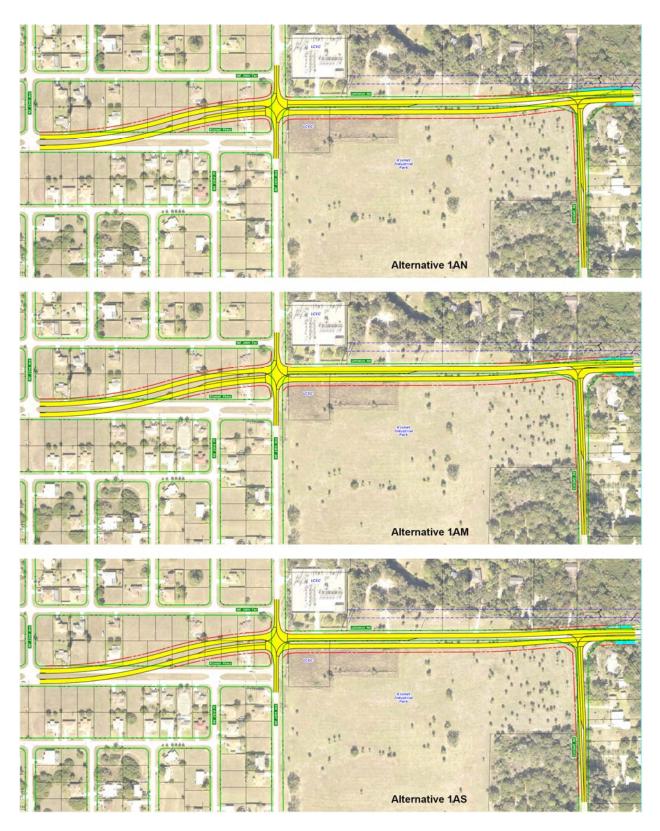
North Alternatives with T-intersection at Corbett Rd
